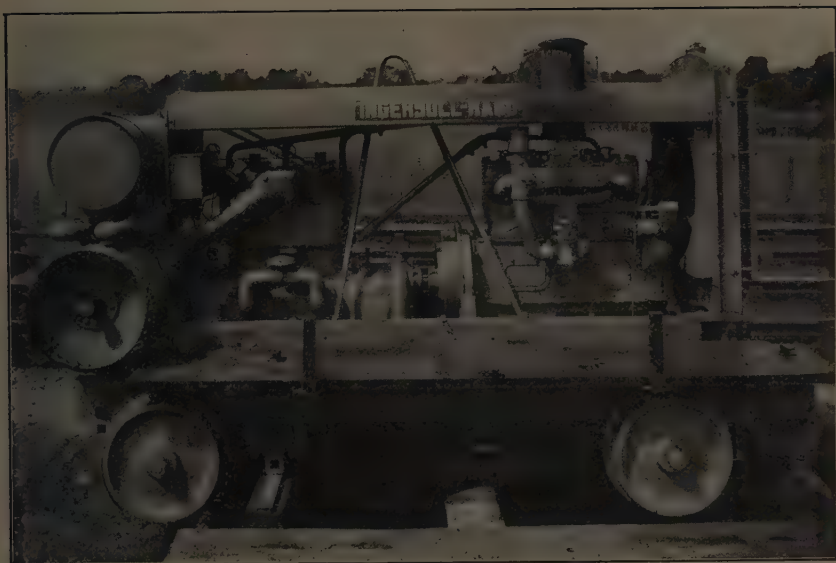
Compressed-air ballast packer. Air compressor. Great Western Railway, England.
